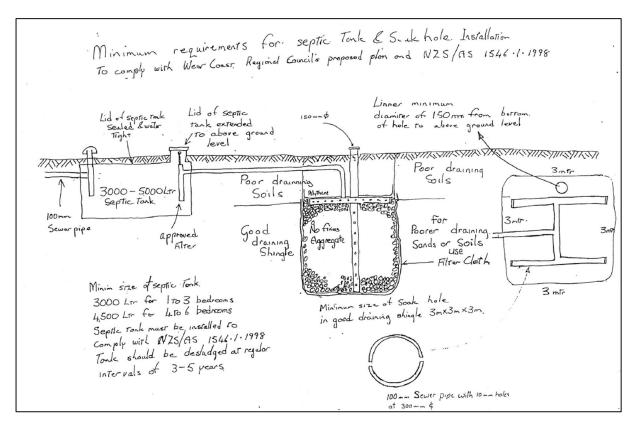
Diagram illustrating typical minimum installation requirements of on-site septic systems at Moana
